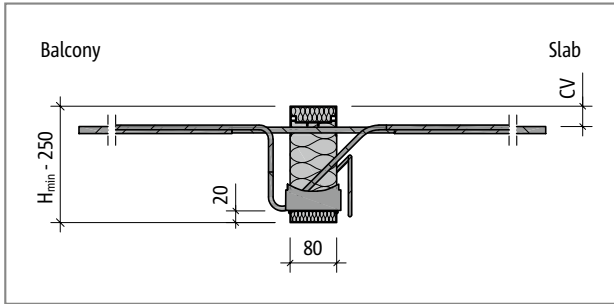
Schöck Isokorb® T type K-E-M6, K-T-M7, -M9, -M10: Product section
